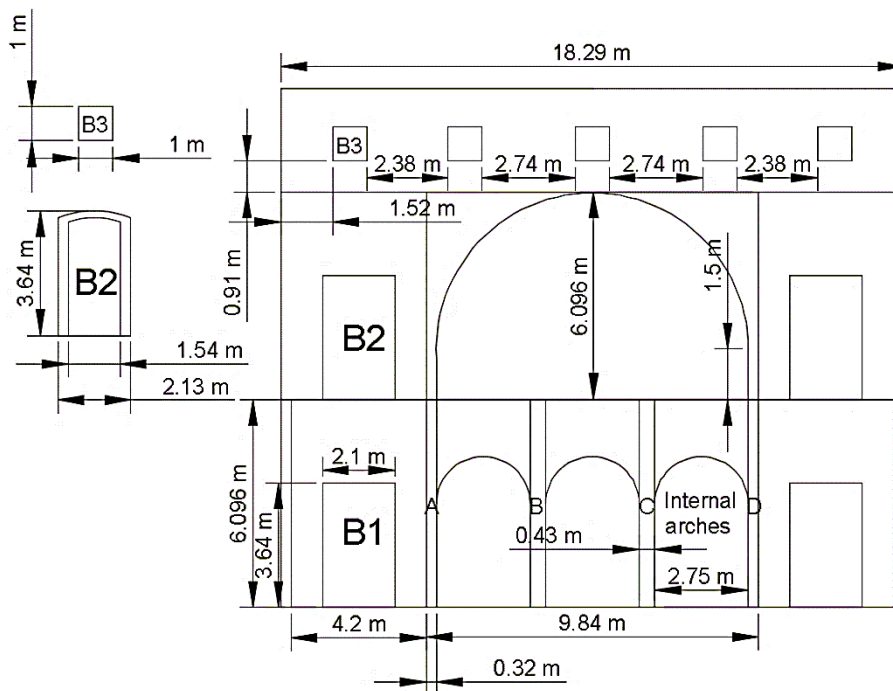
Elevation of unreinforced Internal Masonry wall (Indo-Sarascenic Style).
